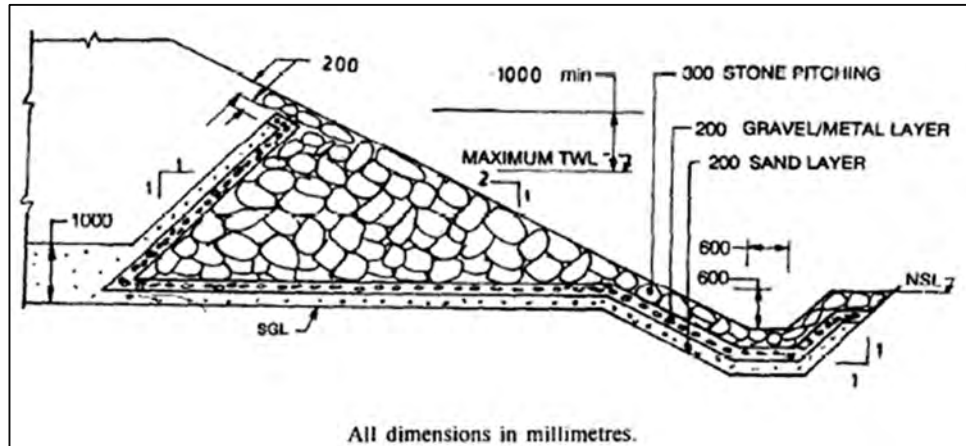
Details of Rock Toe Protection with Toe Drain Where Tail Water Level (TWL) is higher than Stripped Ground Level (SGL)
